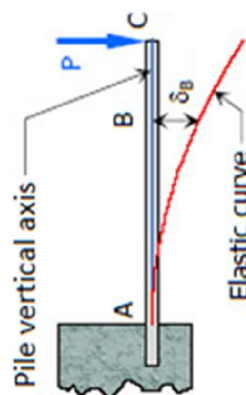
Pile schematic as a cantilever beam, a point as a bedrock
